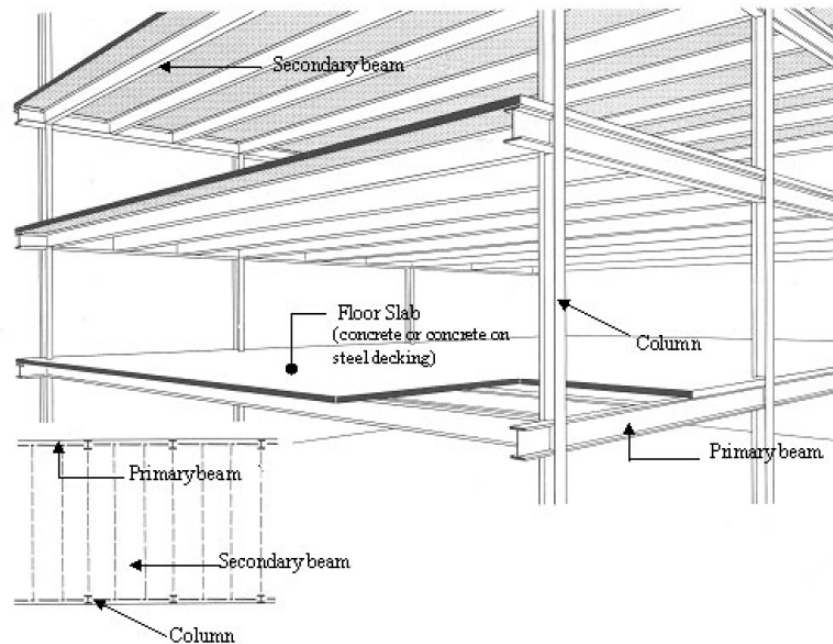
Composite steel-concrete floor system (Clifton, 2006)
